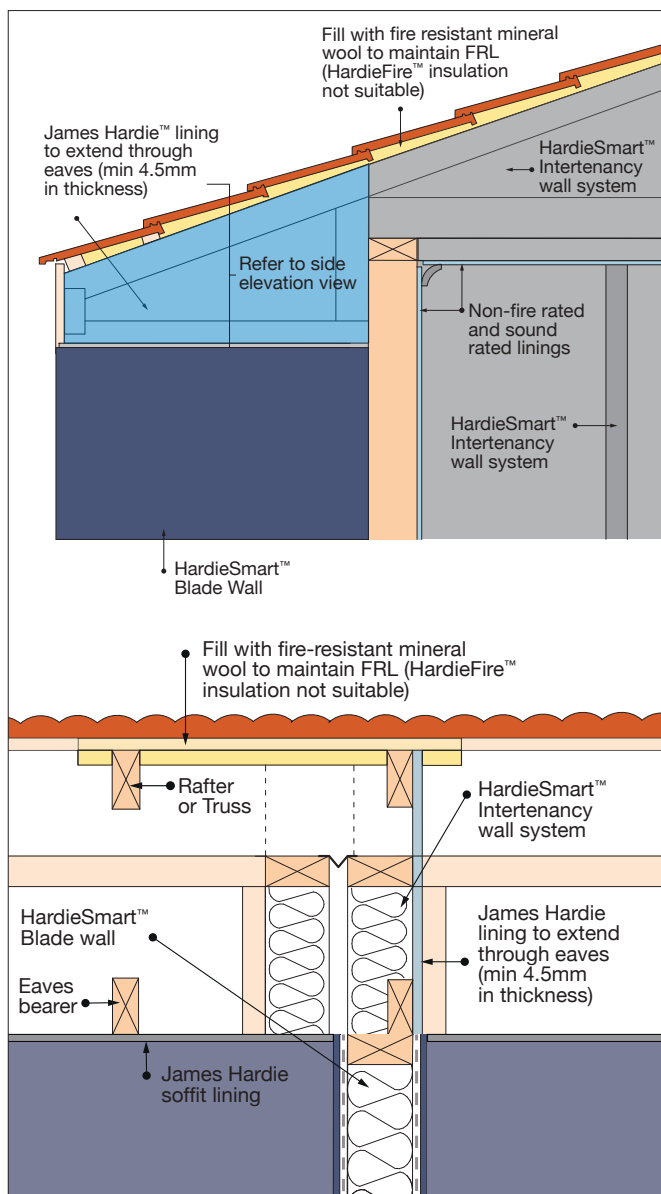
HARDIESMART™ BLADE WALL EAVES SEPARATION
